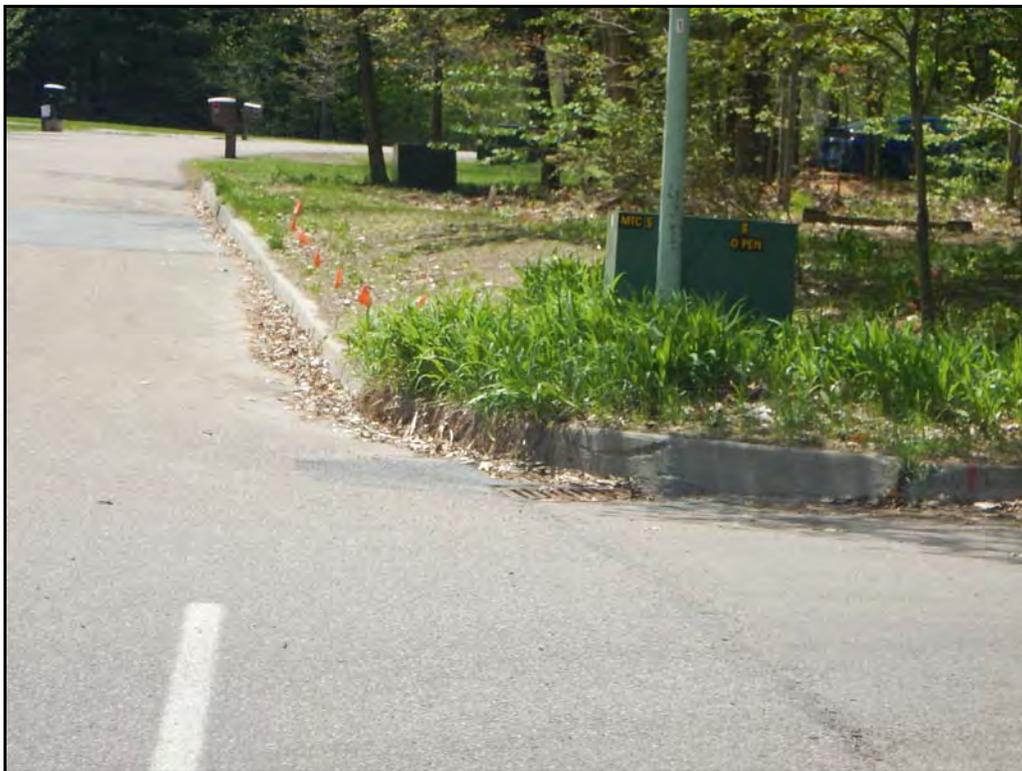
Photo shows utility locations on Tanglewood Drive just west of the intersection with Cindy Lane. View is to the southwest.
